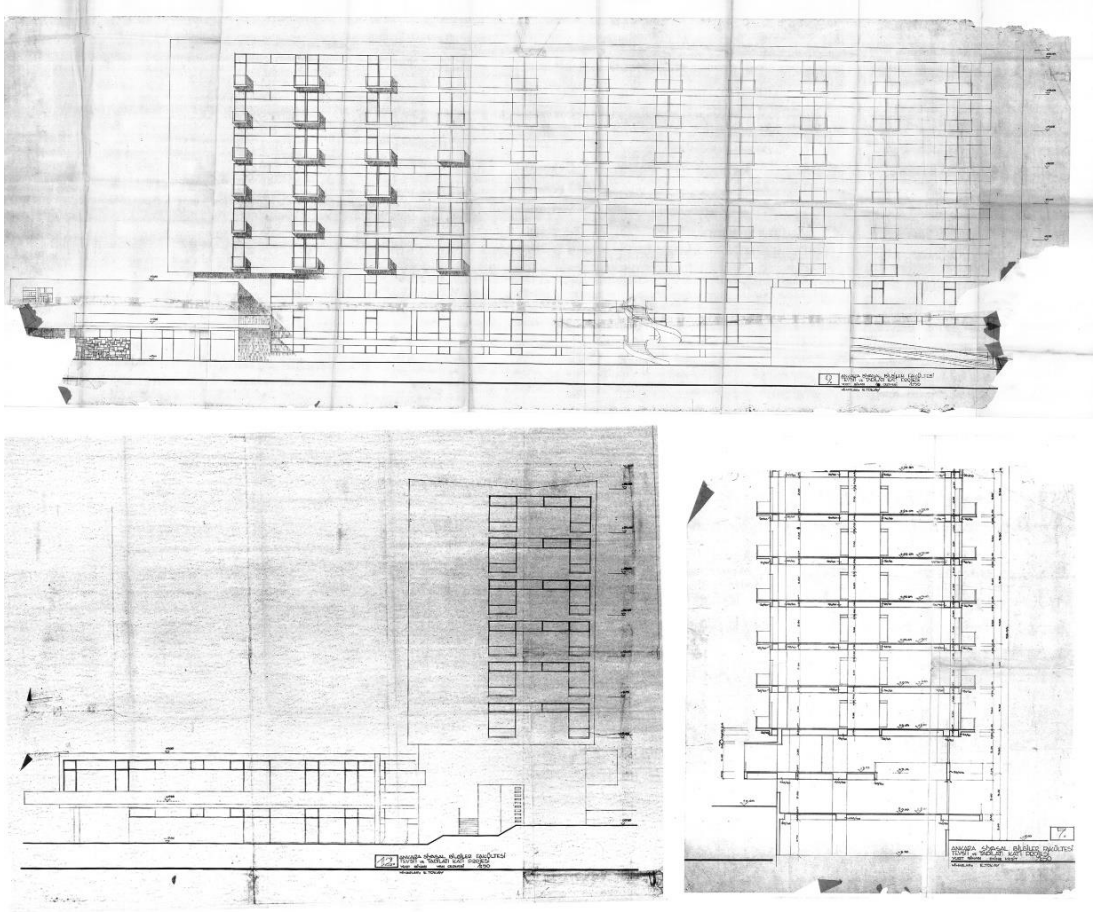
Original section and elevation drawings of the dormitory building (archive of Ankara University Directorate of Construction and Technical Works)
